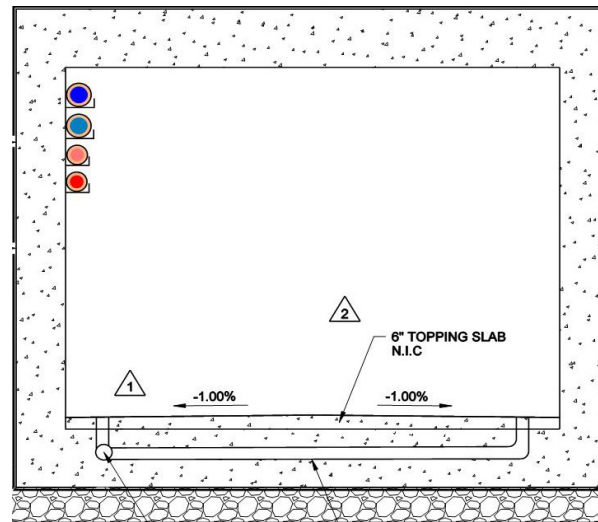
Conceptual Arrangement of District Thermal Pipes
